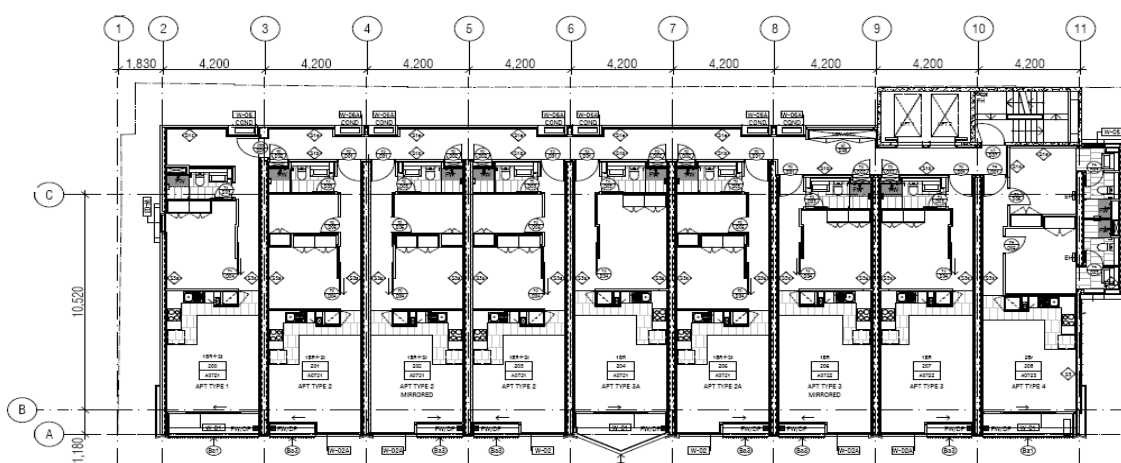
Standard floor plan for single-storey apartments (FKA 2009)
